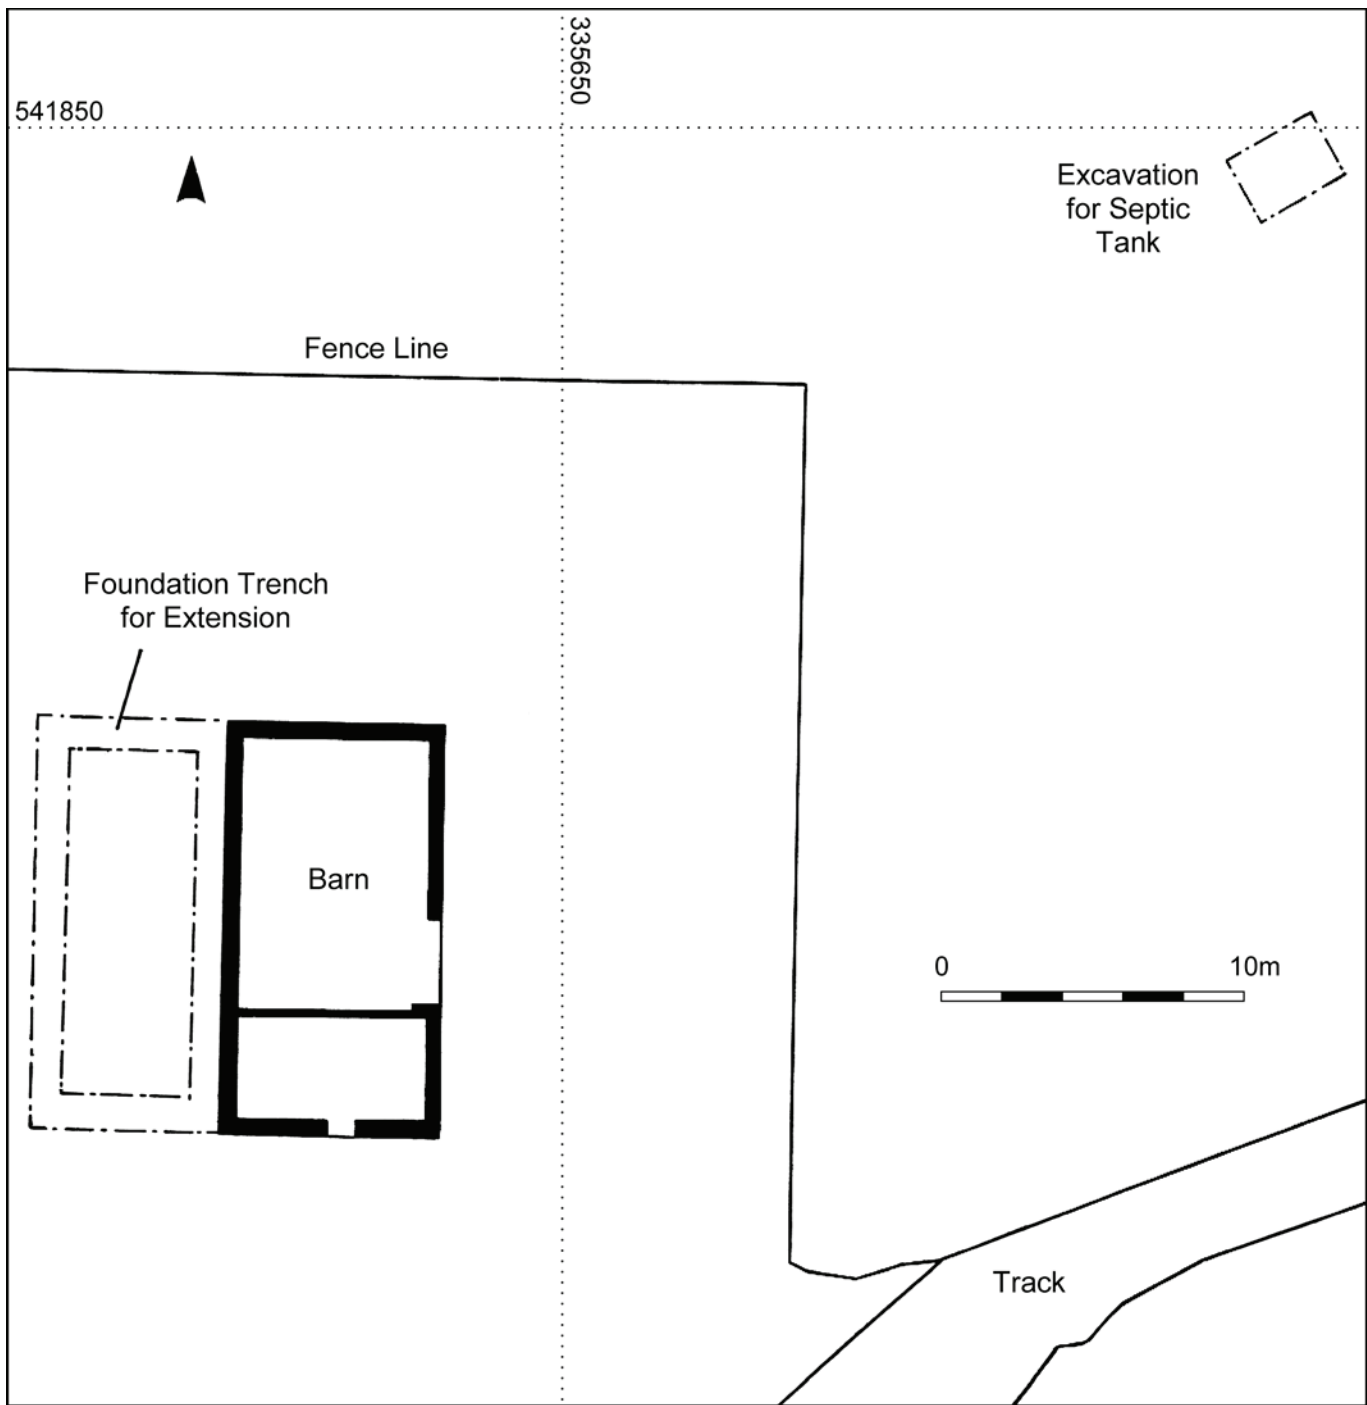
Trench location plan. Scale 1:250 (illustration: P. Cracknell)
